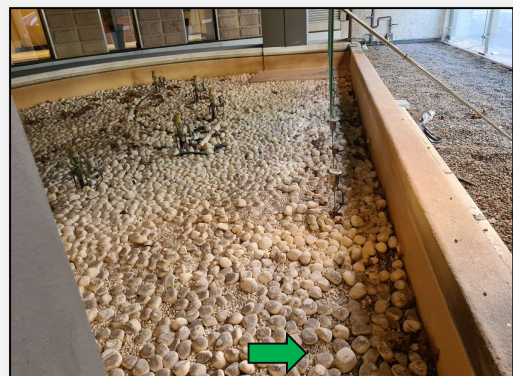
Level 5, external, southern water feature flooring membrane - non-asbestos bituminous membrane.
